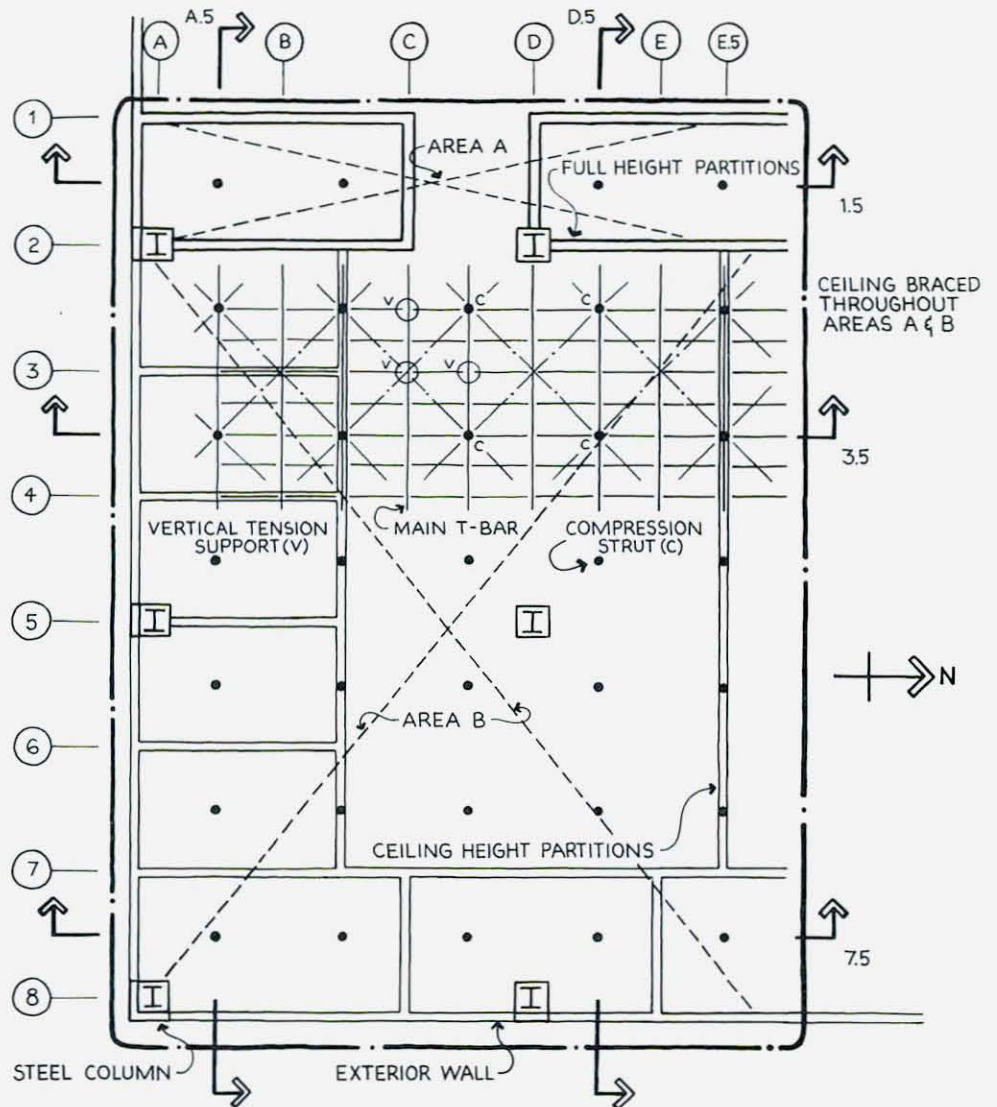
FLOOR PLAN OF A HYPOTHETICAL BUILDING SECTION.
